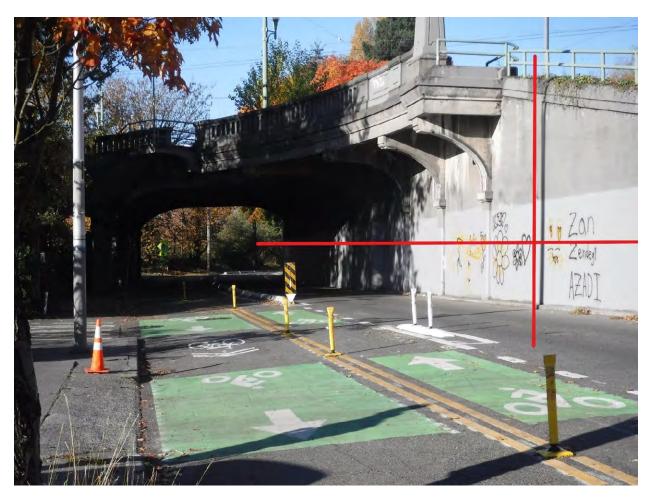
North approach, abutment looking west from NE 40th Street, configuration of abutment highlighted in red. Note that the sidewalk runs along the east edge of the abutment from the deck of the approach to NE 40th Street (photo by HDR 2023).
